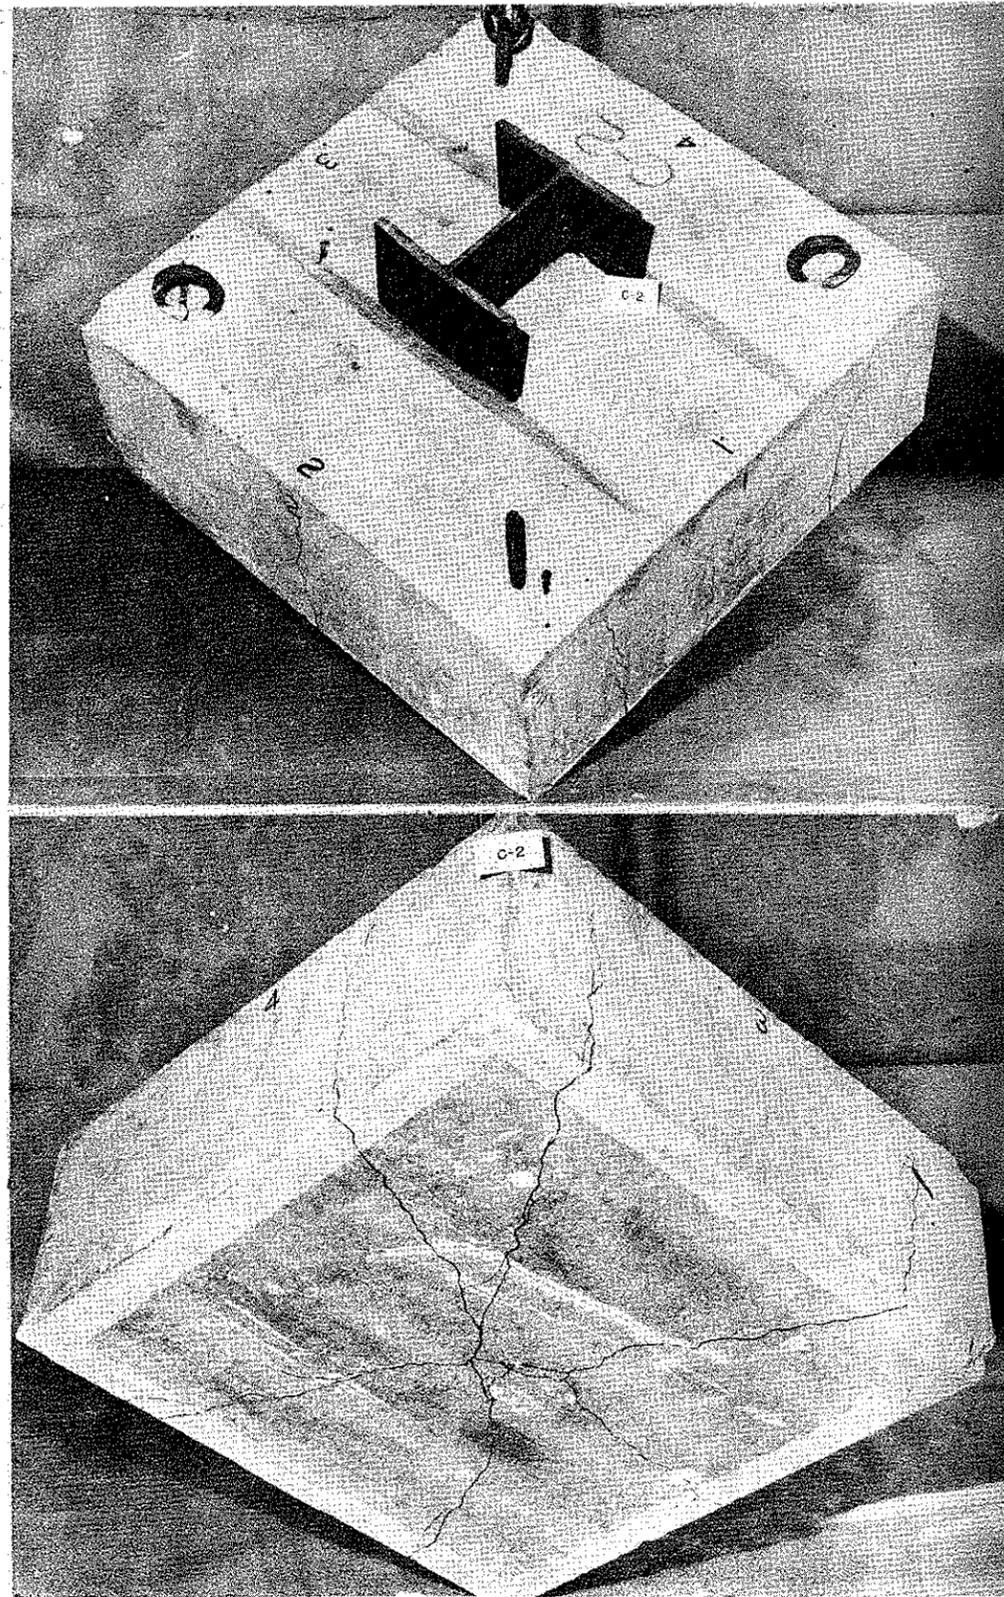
APPEARANCE OF SPECIMEN C-2 AFTER TESTING.
